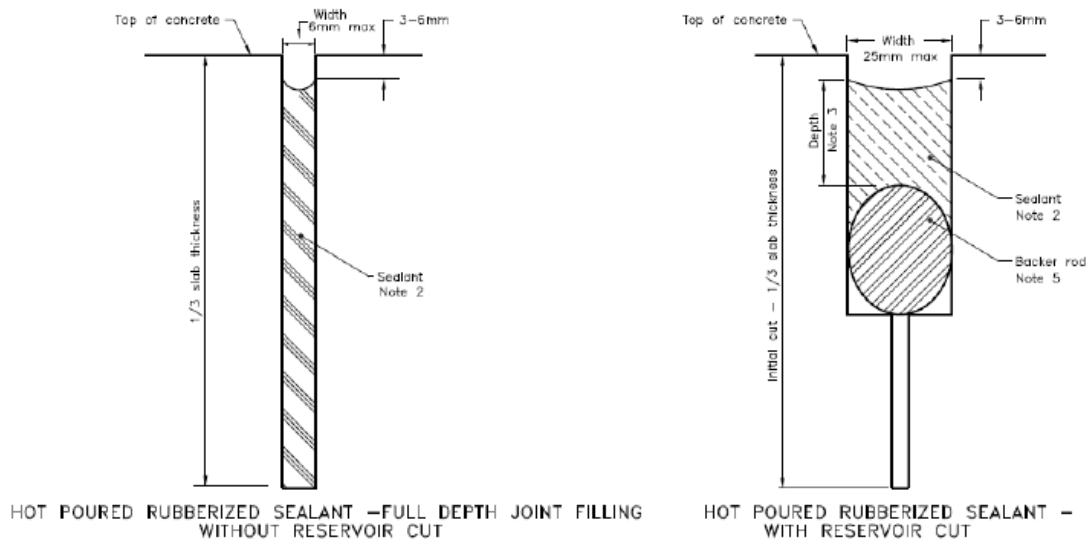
New (left) and old (right) joint design schematics (MTO 2018).
